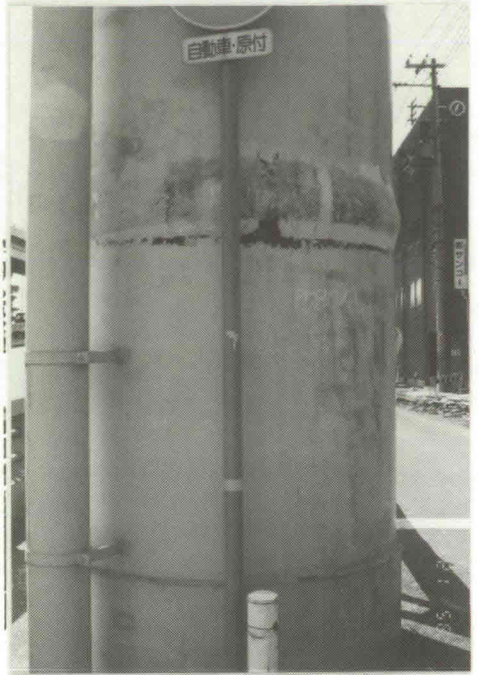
Locally buckled steel pier of single-post elevated expressway; pier bulging where the paint has fallen away around nearly 360° in what we call elephant foot buckling (Kobe Route, at a ramp near Japan Railway's Hyogo Station)
